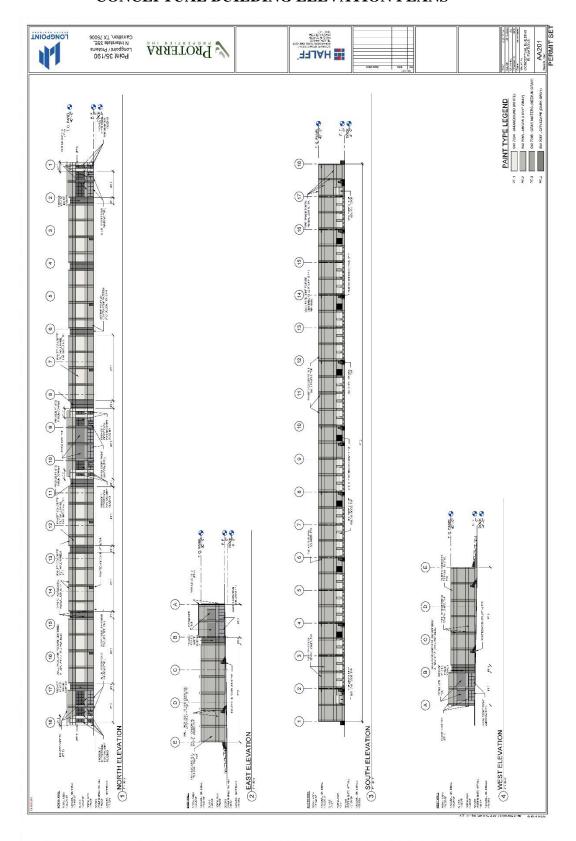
EXHIBIT E CONCEPTUAL BUILDING ELEVATION PLANS
